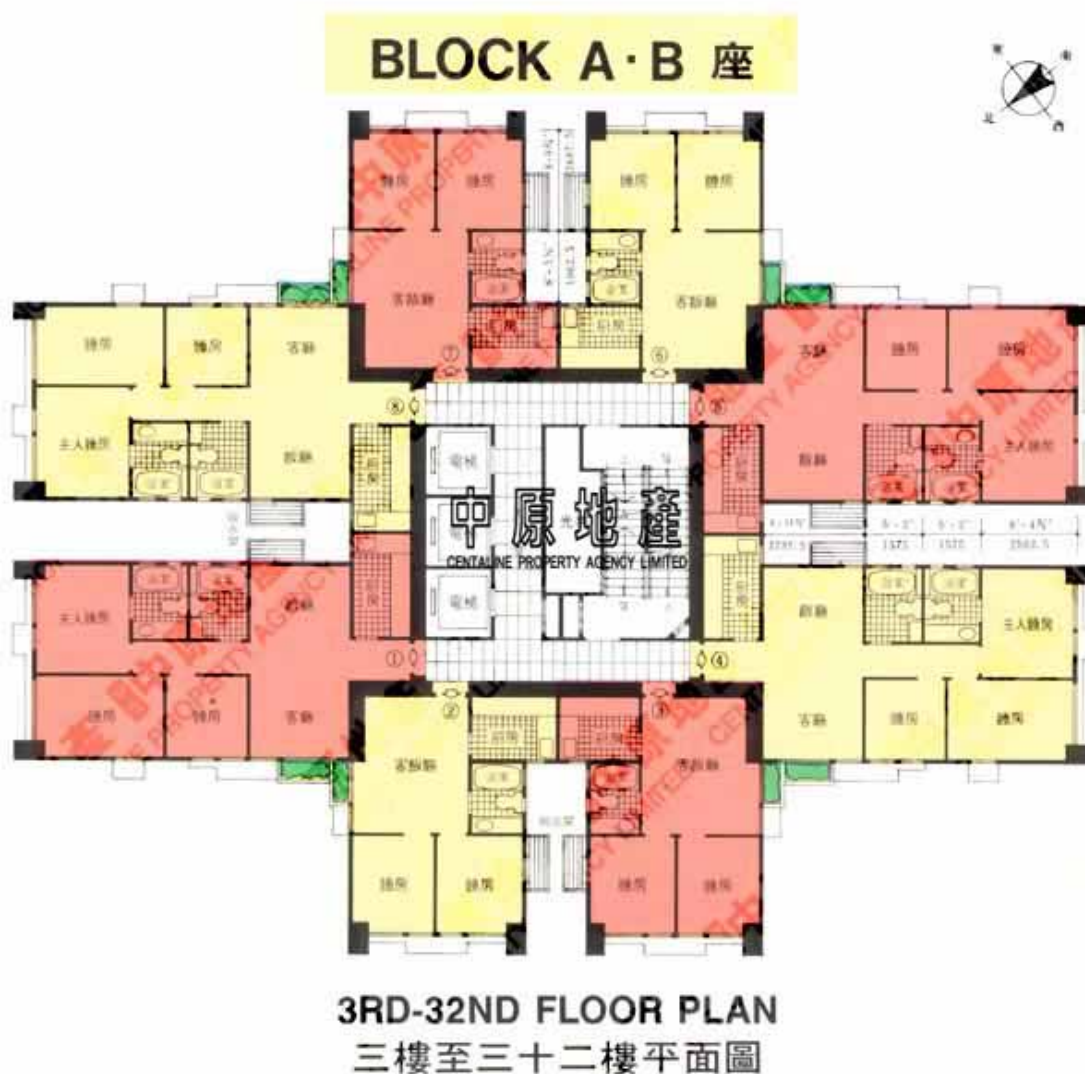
Building Plan of Block A of Sunshine City (In affecting group)
